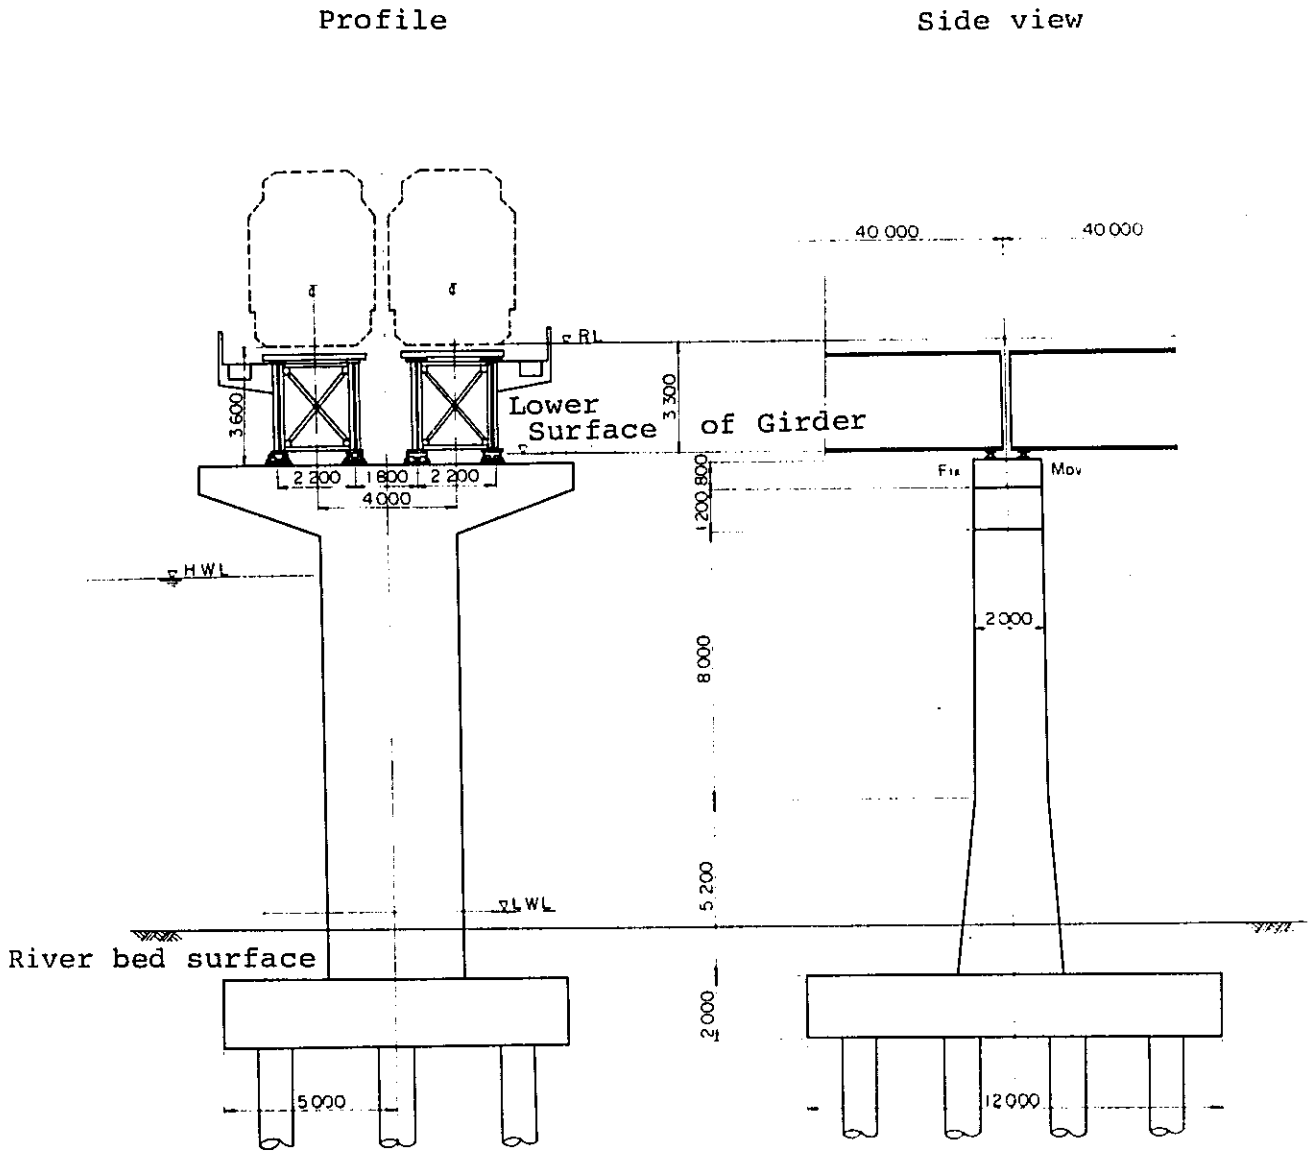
Standard Design of Deck Steel Girder Bridge
